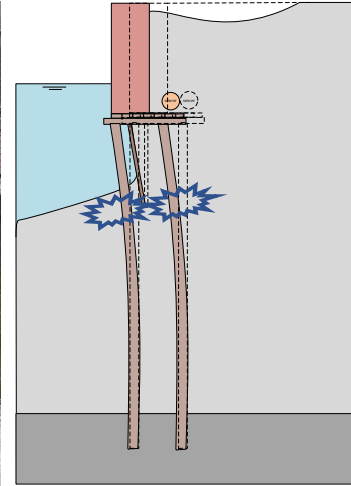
, Schematization on the lateral failure of the Grimburgwal pile foundation.
